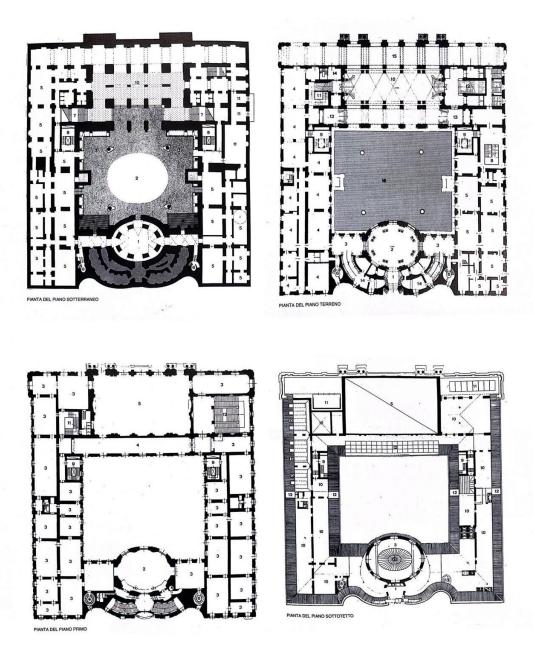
Plans at different levels. Imagine from Progetto 1985 (A, Bruno, A. I. Studio). Piante ai diversi livelli.Il salone sotterraneo al cortile è coperto da un solettone retto da quattro pilastri; un'intercapedine ispezionabile lo isok dalle fondazioni del palazzo.
